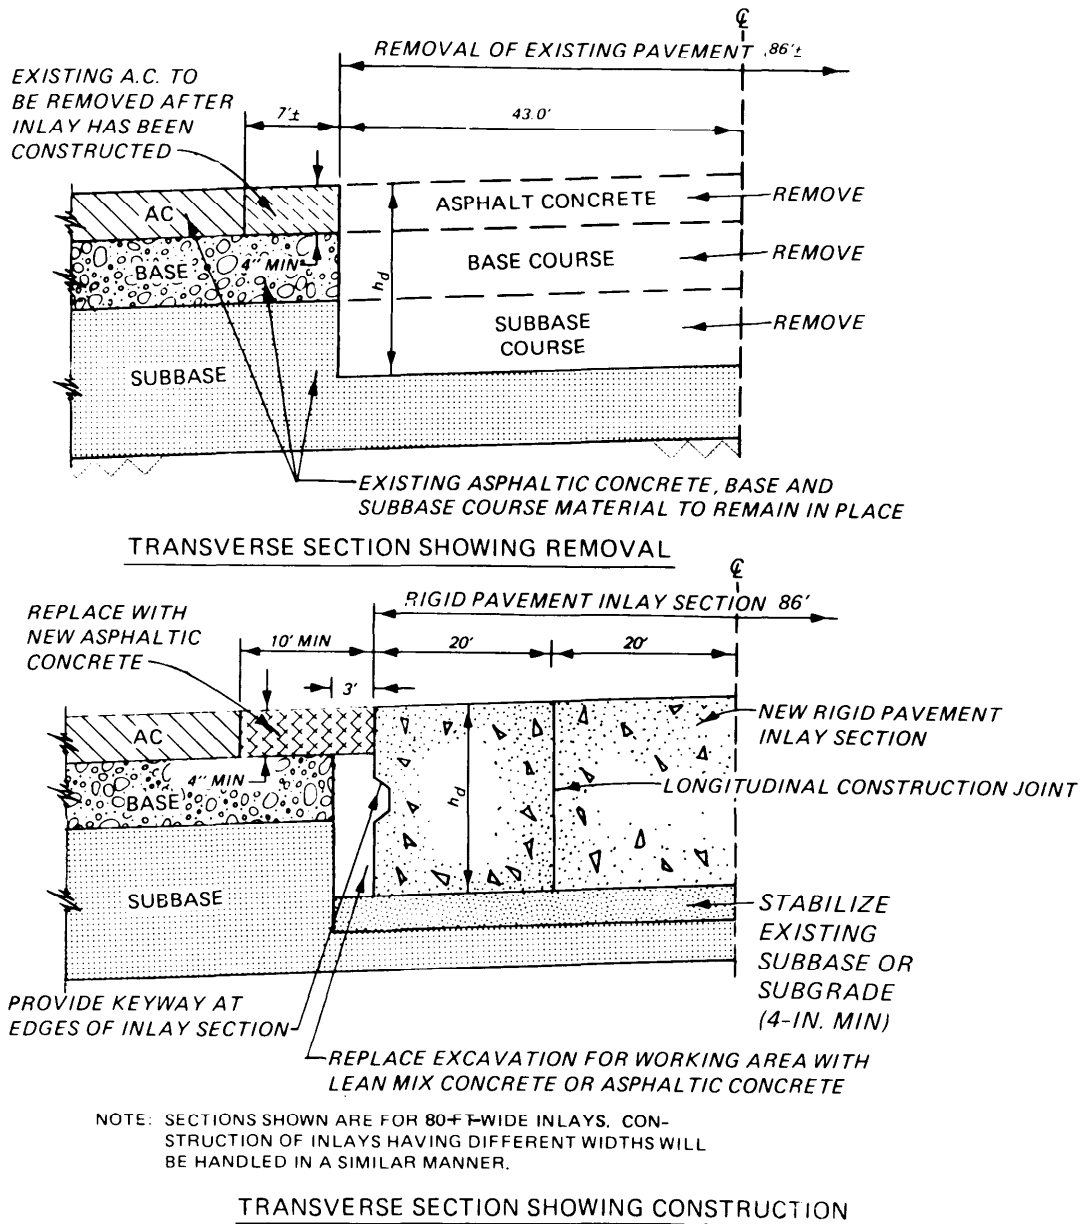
Typical rigid pavement inlay in existing flexible pavement.
